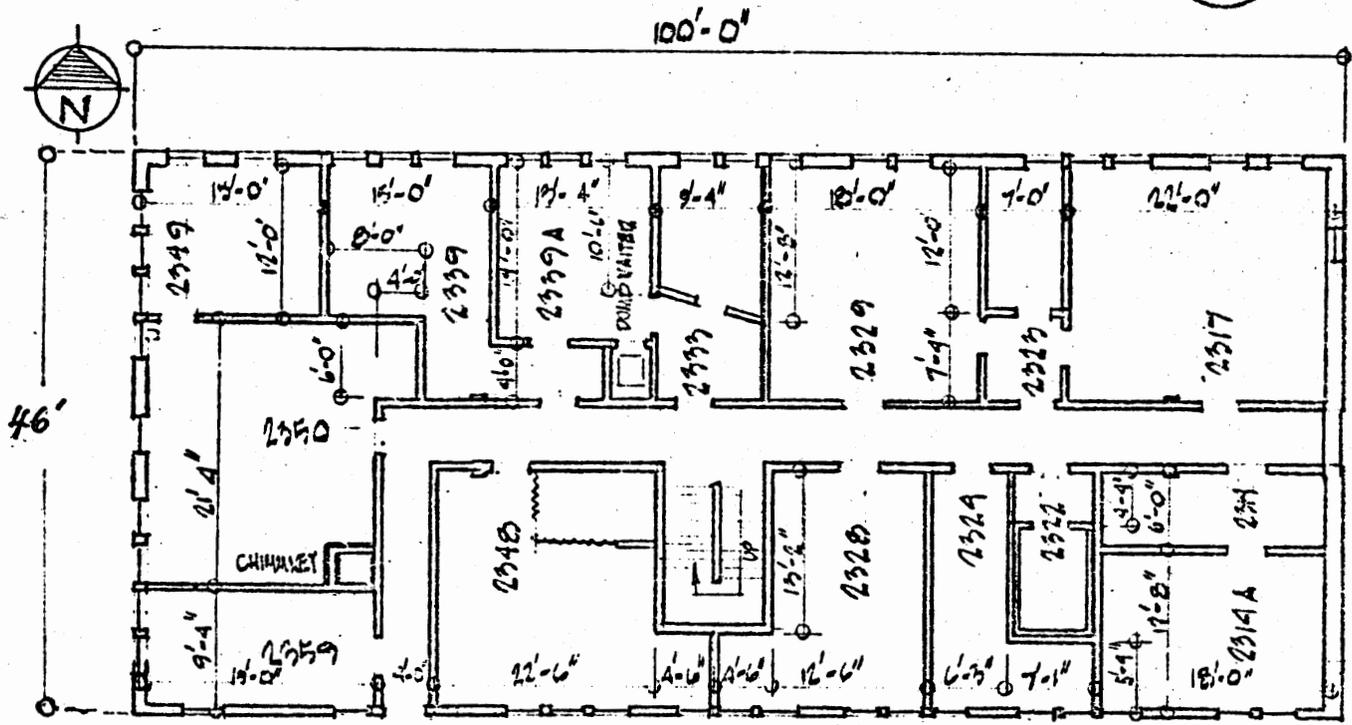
SECOND FLOOR PLAN OF OLD RITTER HALL IN 1938:
